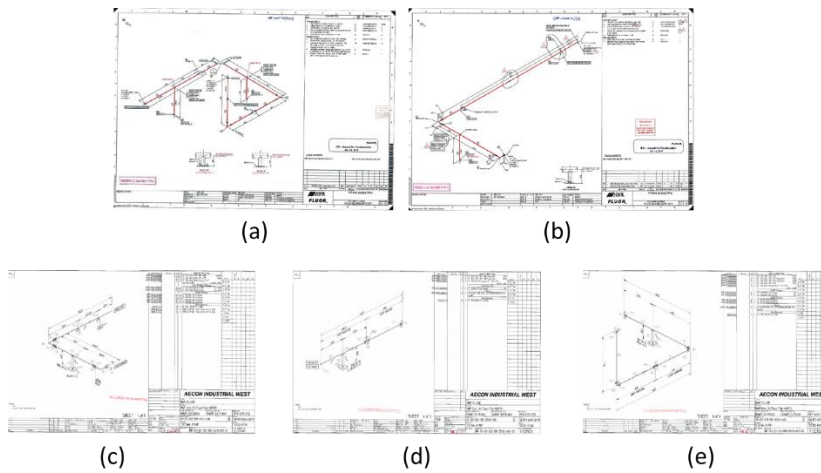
Multiple isometrics translated to multiple cutsheets. (a) and (b) isometric drawings of an assembly. (c), (d) and (e) cutsheets derived from the corresponding isometrics (refer to Appendix C for larger images).
